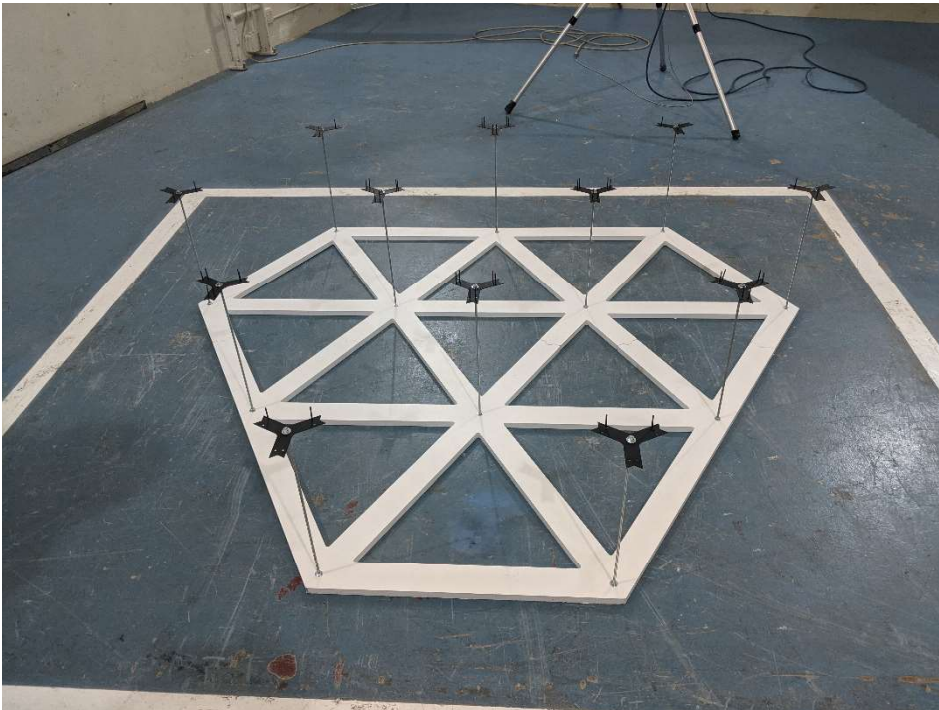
Base frame and support rods in test chamber prior to installation of glass units
